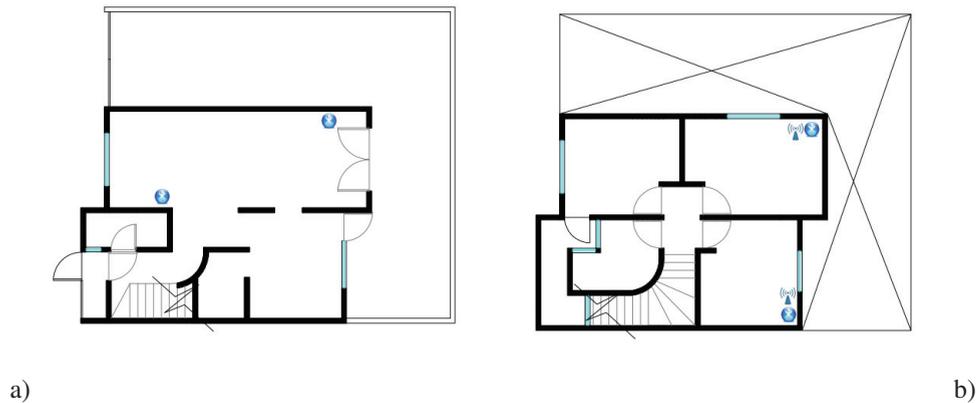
Real house plans with available WLAN and Bluetooth stations distribution, (a) first floor; (b) second floor
